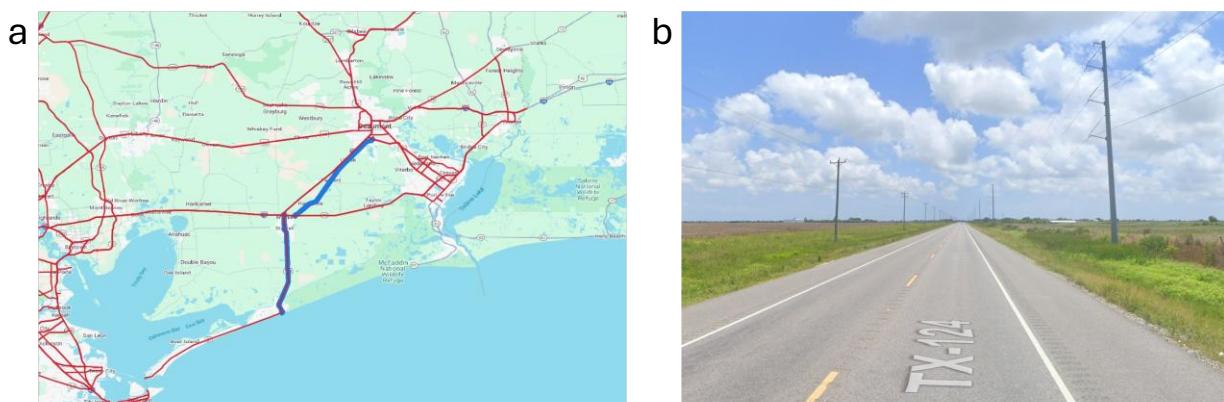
SH0124 Case Study: (a) Location and (b) Typical Pavement Surface View.
